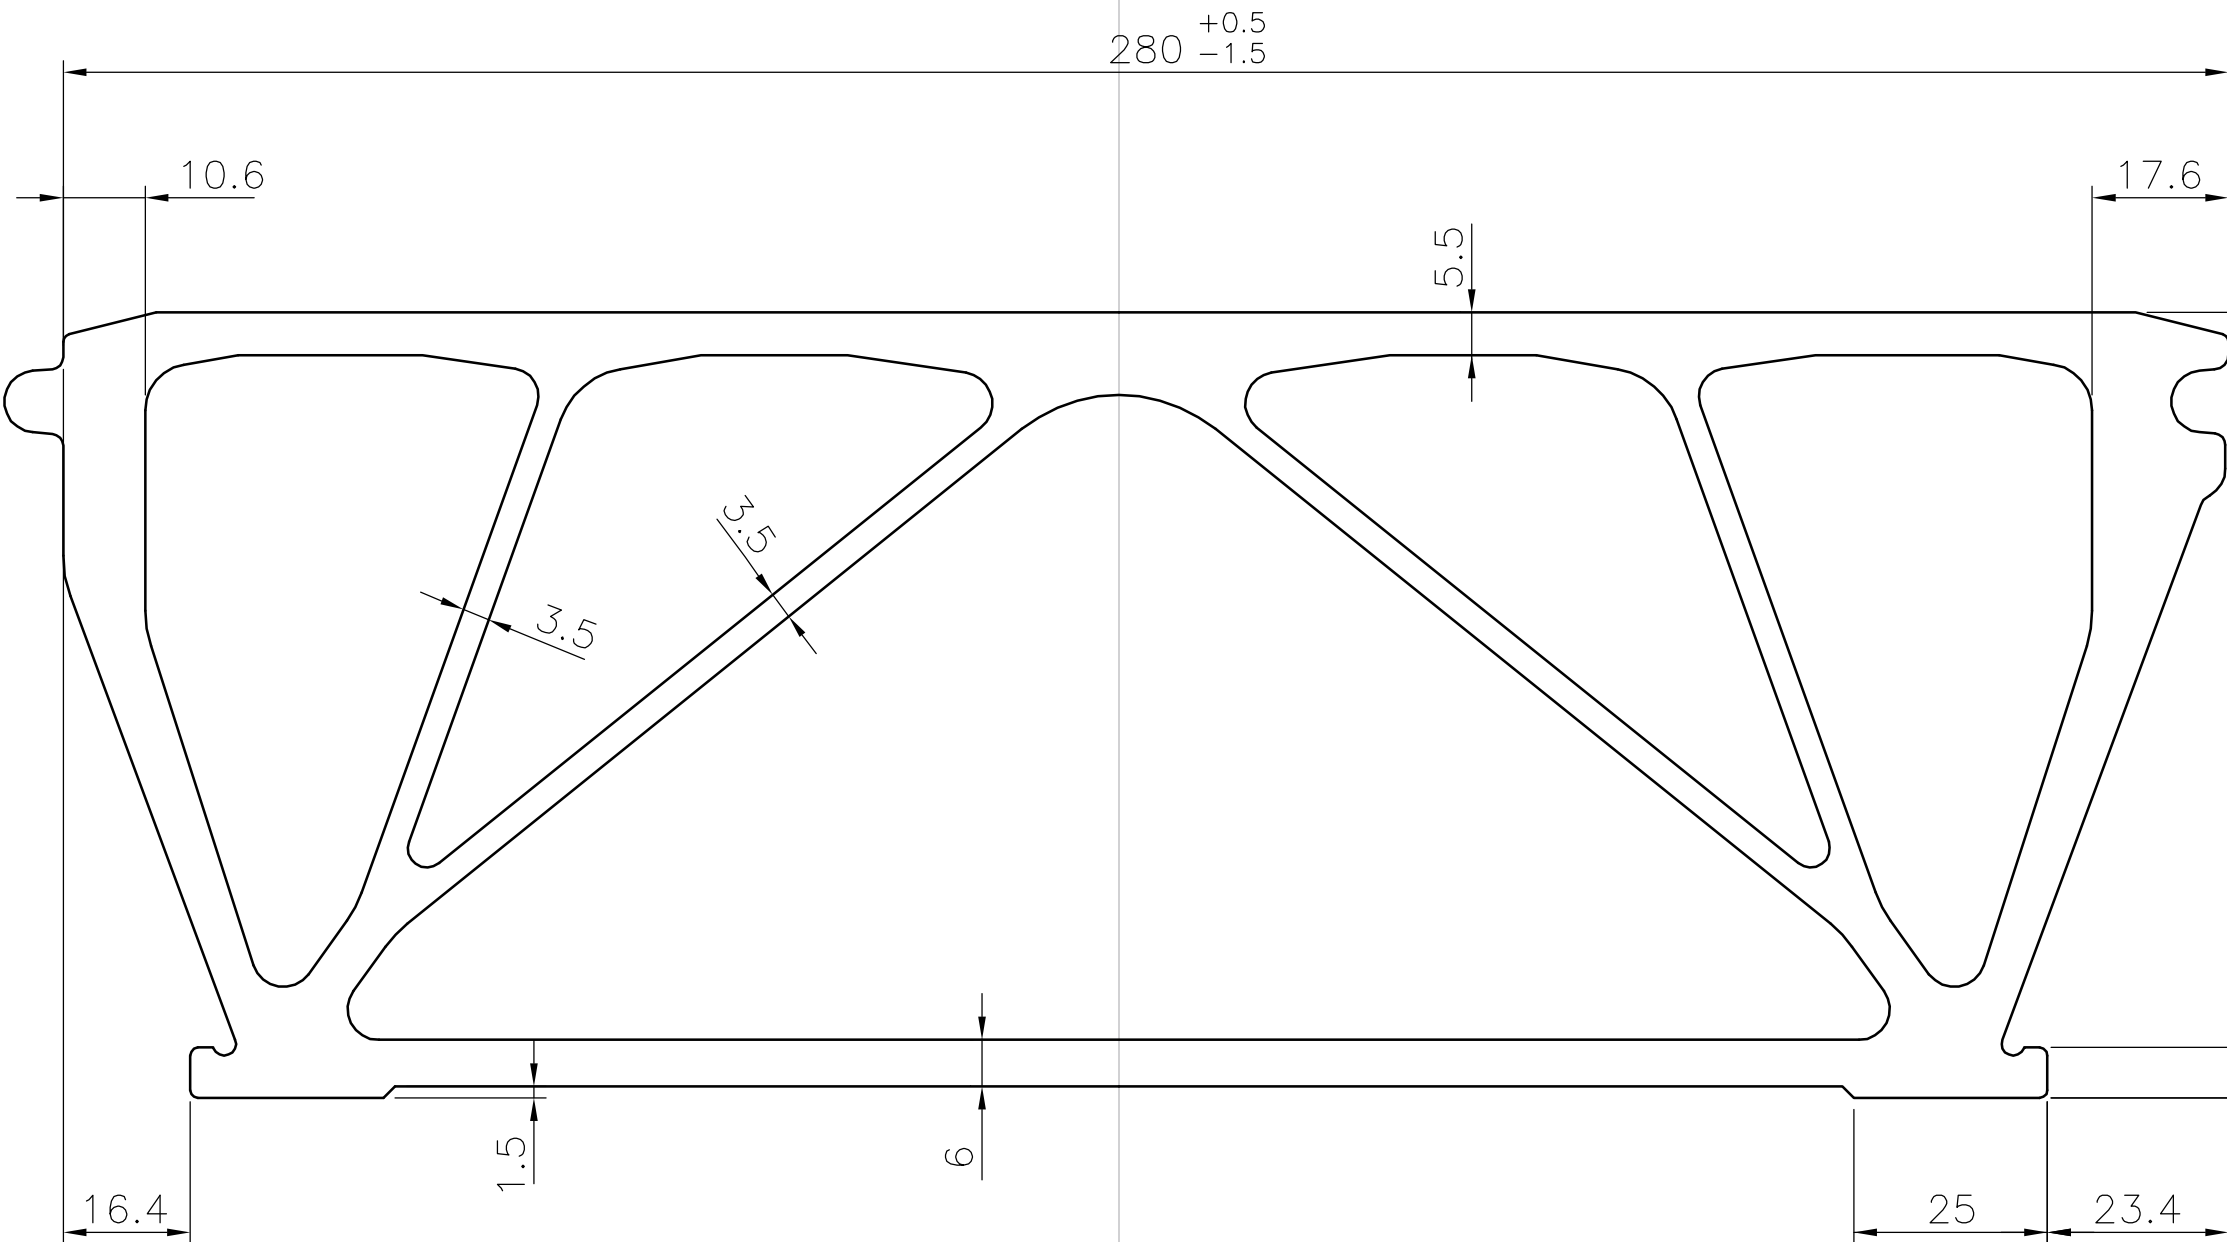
Sapa extruded aluminium bridge deck system: 100mm deep with extrusion 100mm × 250mm, 1:1, note all dimensions shown in mm
